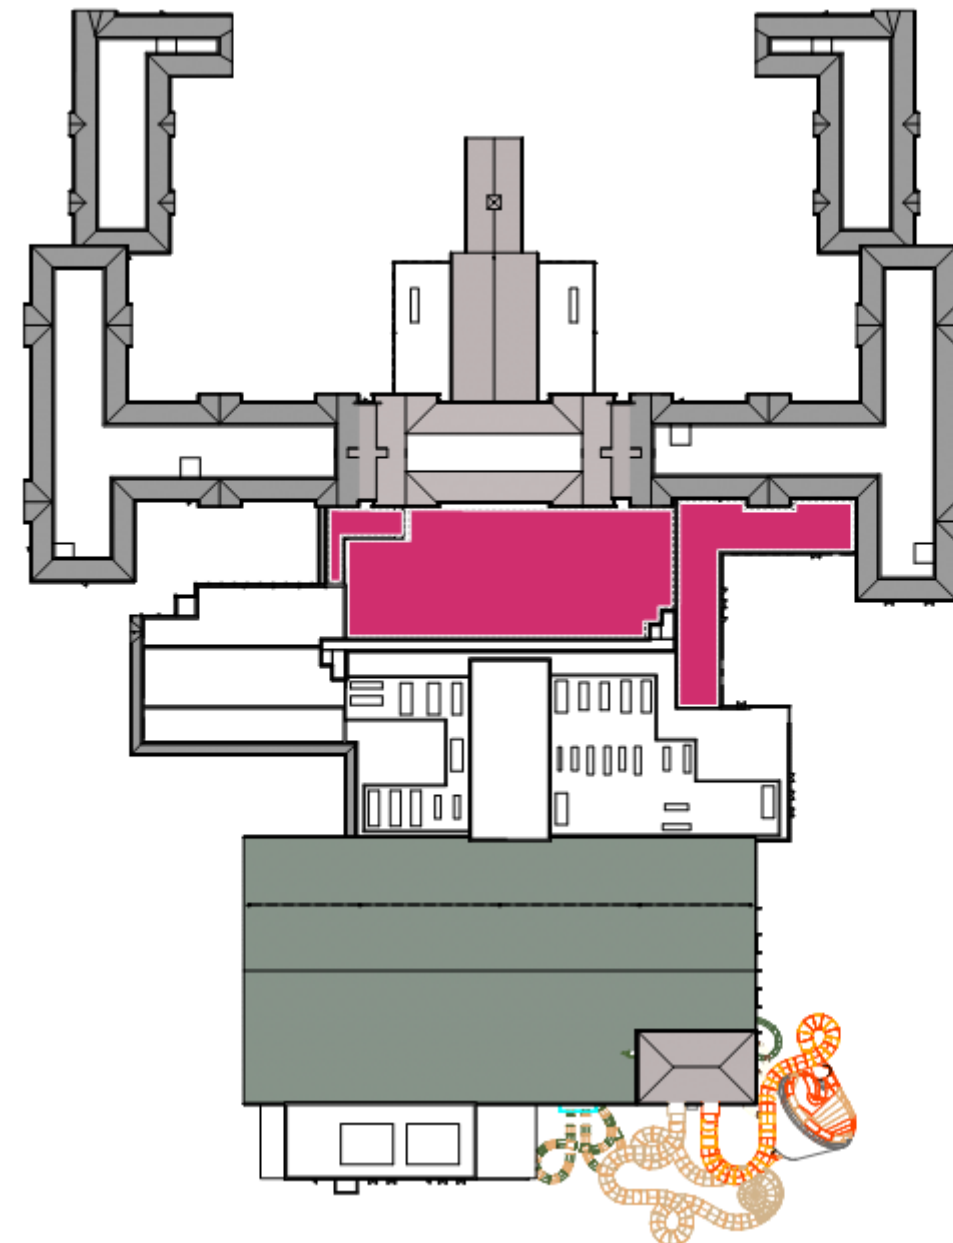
Green roof allocation shown in pink colour on three roof areas at the centre of the Proposed Development. Source: EPR Architects (with Hoare Lea mark-up for clarity)
